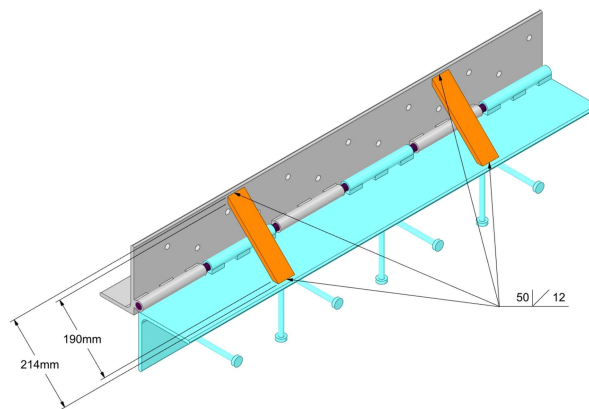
Isometric view of hinge assembly with proposed retrofits
